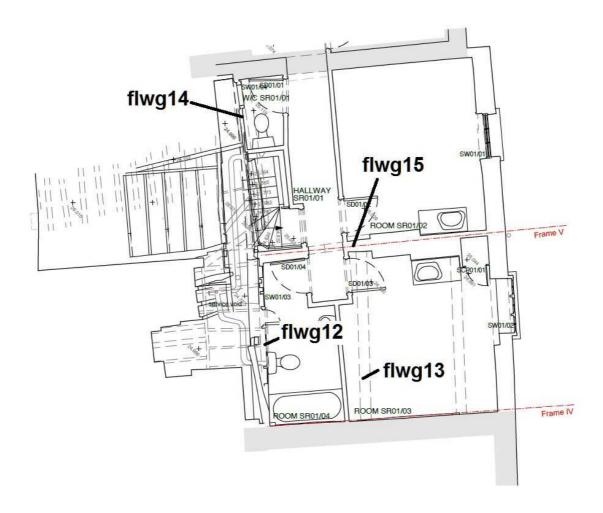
Plan of the northern rooms of the Westgate range (fronting on Westgate Street) showing timbers sampled (after Butler Hegarty Architects)
